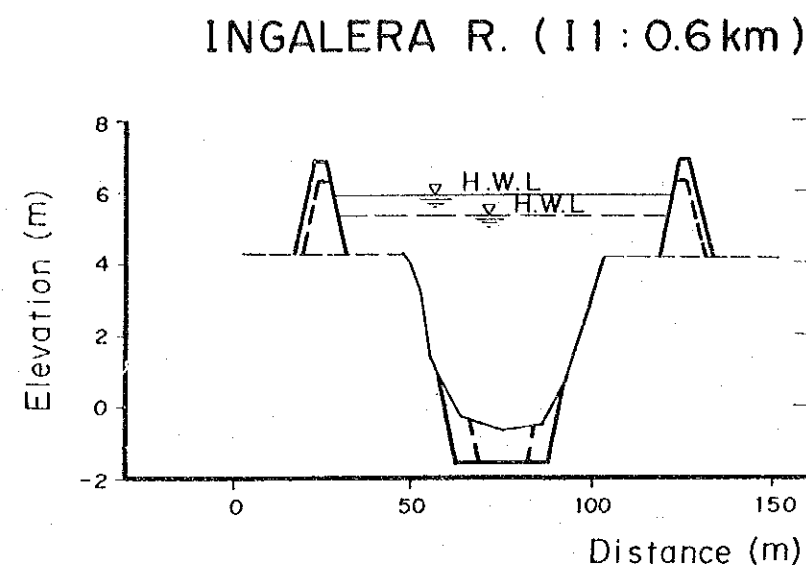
TYPICAL CROSS-SECTION OF INGALERA RIVER
